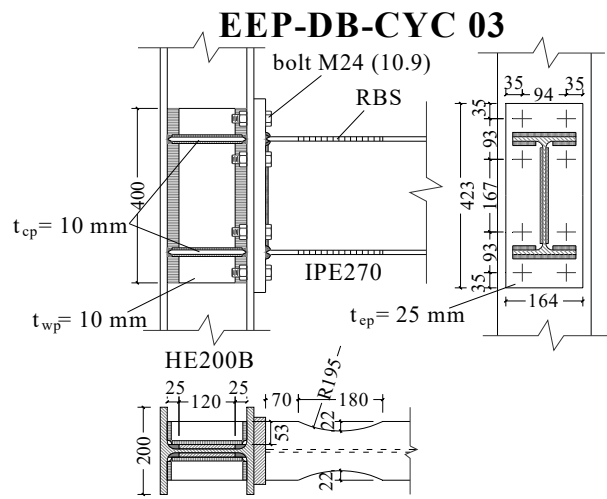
Structural details of EEP-DB-CYC 03 connection
